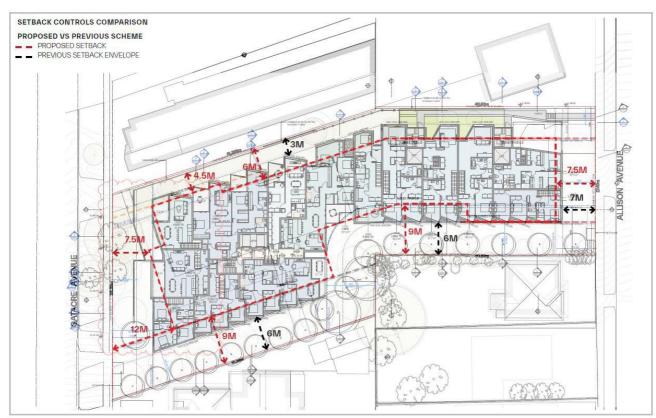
Proposed building setbacks of proposed (red) and previous proposal black. (Source: pdh architects)
